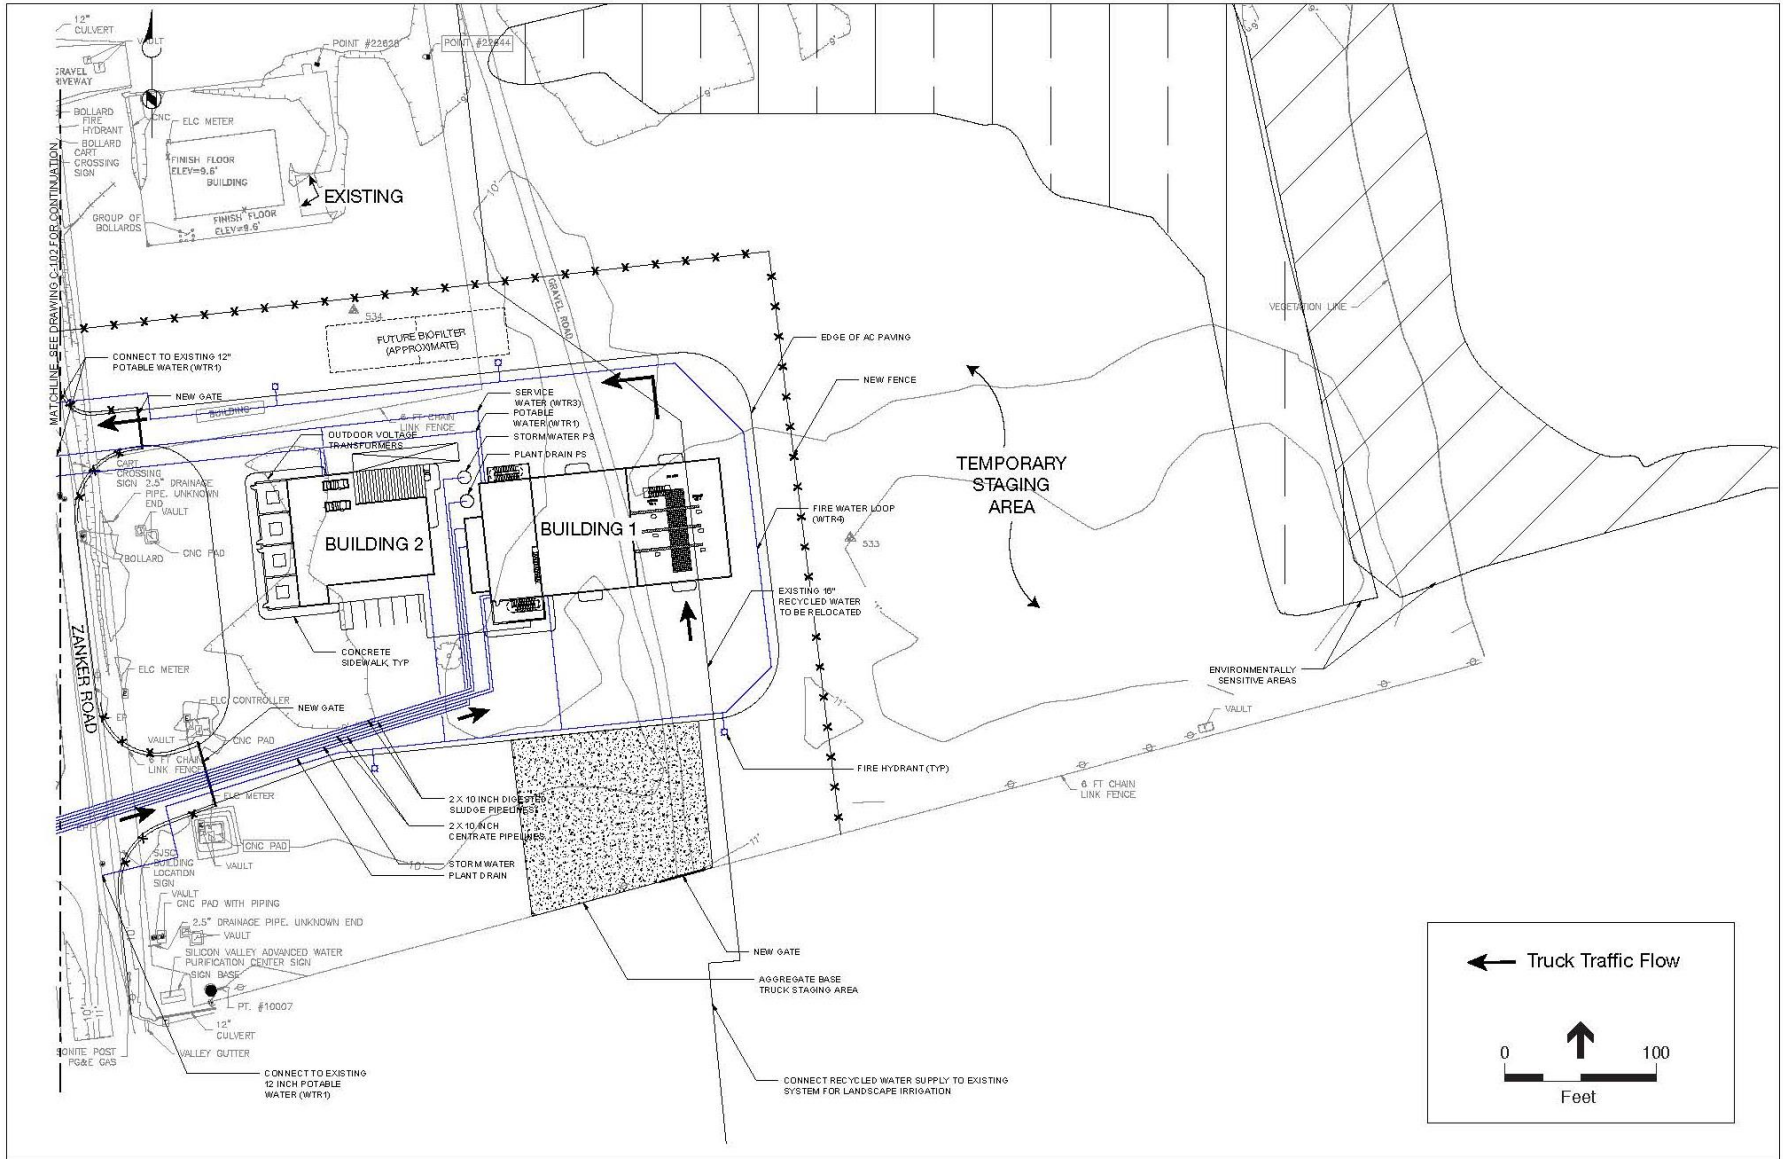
Indicative Design for Alternative 1 - 4-Story Building (Gravity Chute), Setback of 280 Feet from Zanker Road
